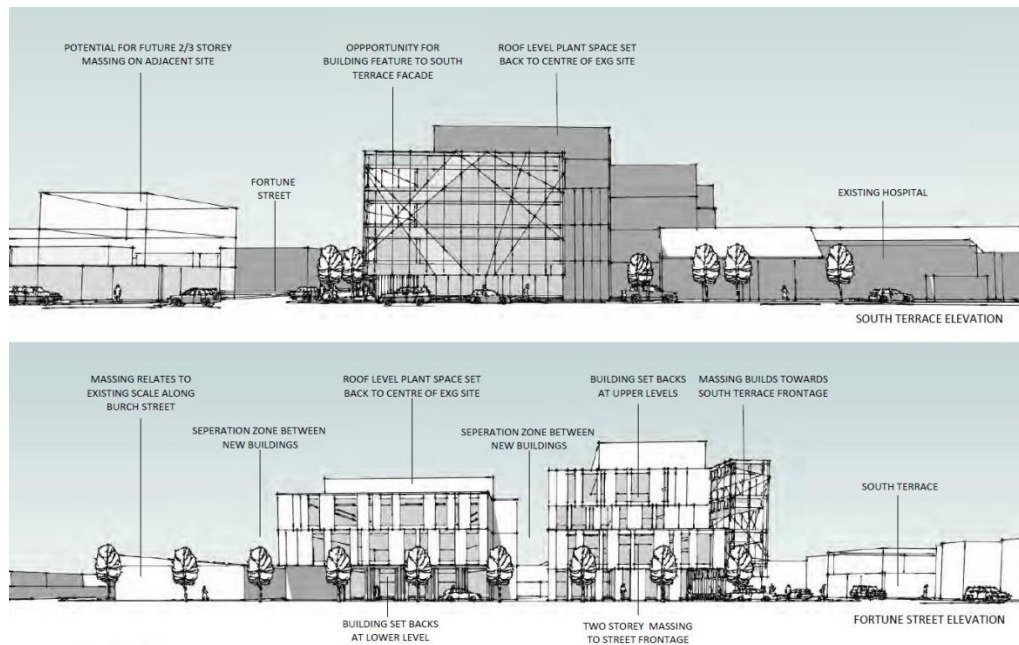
Street elevations concepts expected as a result of the proposed amendment
